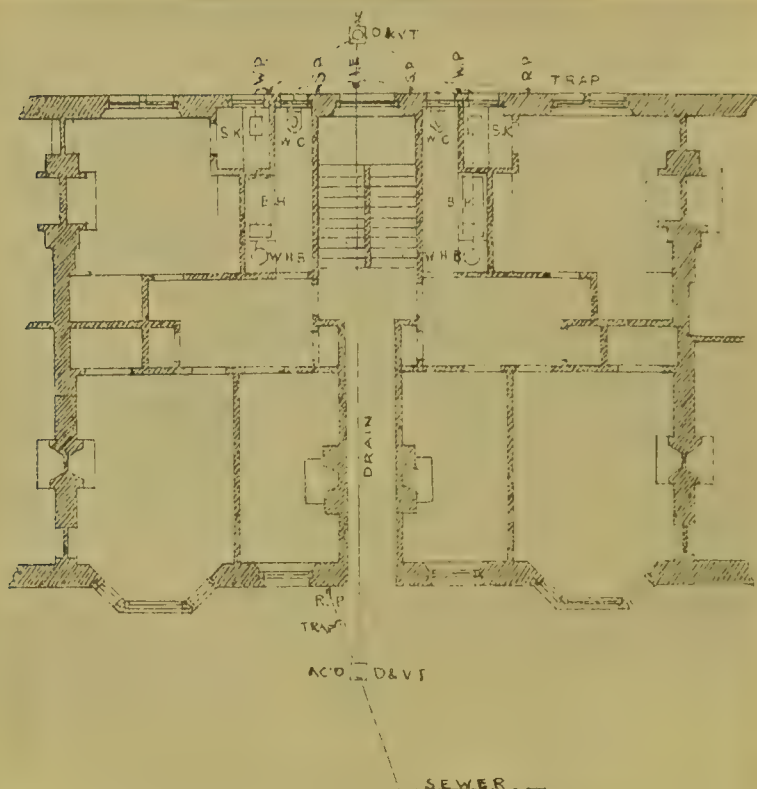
Plan of Draining a Tenement Property. The soil-pipes and waste-pipes pass down the back wall, and their contents into the house-drain, which, in order to reach the sewer in the street, is taken through the common entry. W.P.=Waste-Pipe; S.P.=Soil-Pipe; D. & V.T.=Disconnecting and Ventilating Trap; R.P.=Rain-Pipe; Ac.O.=Access Opening.
